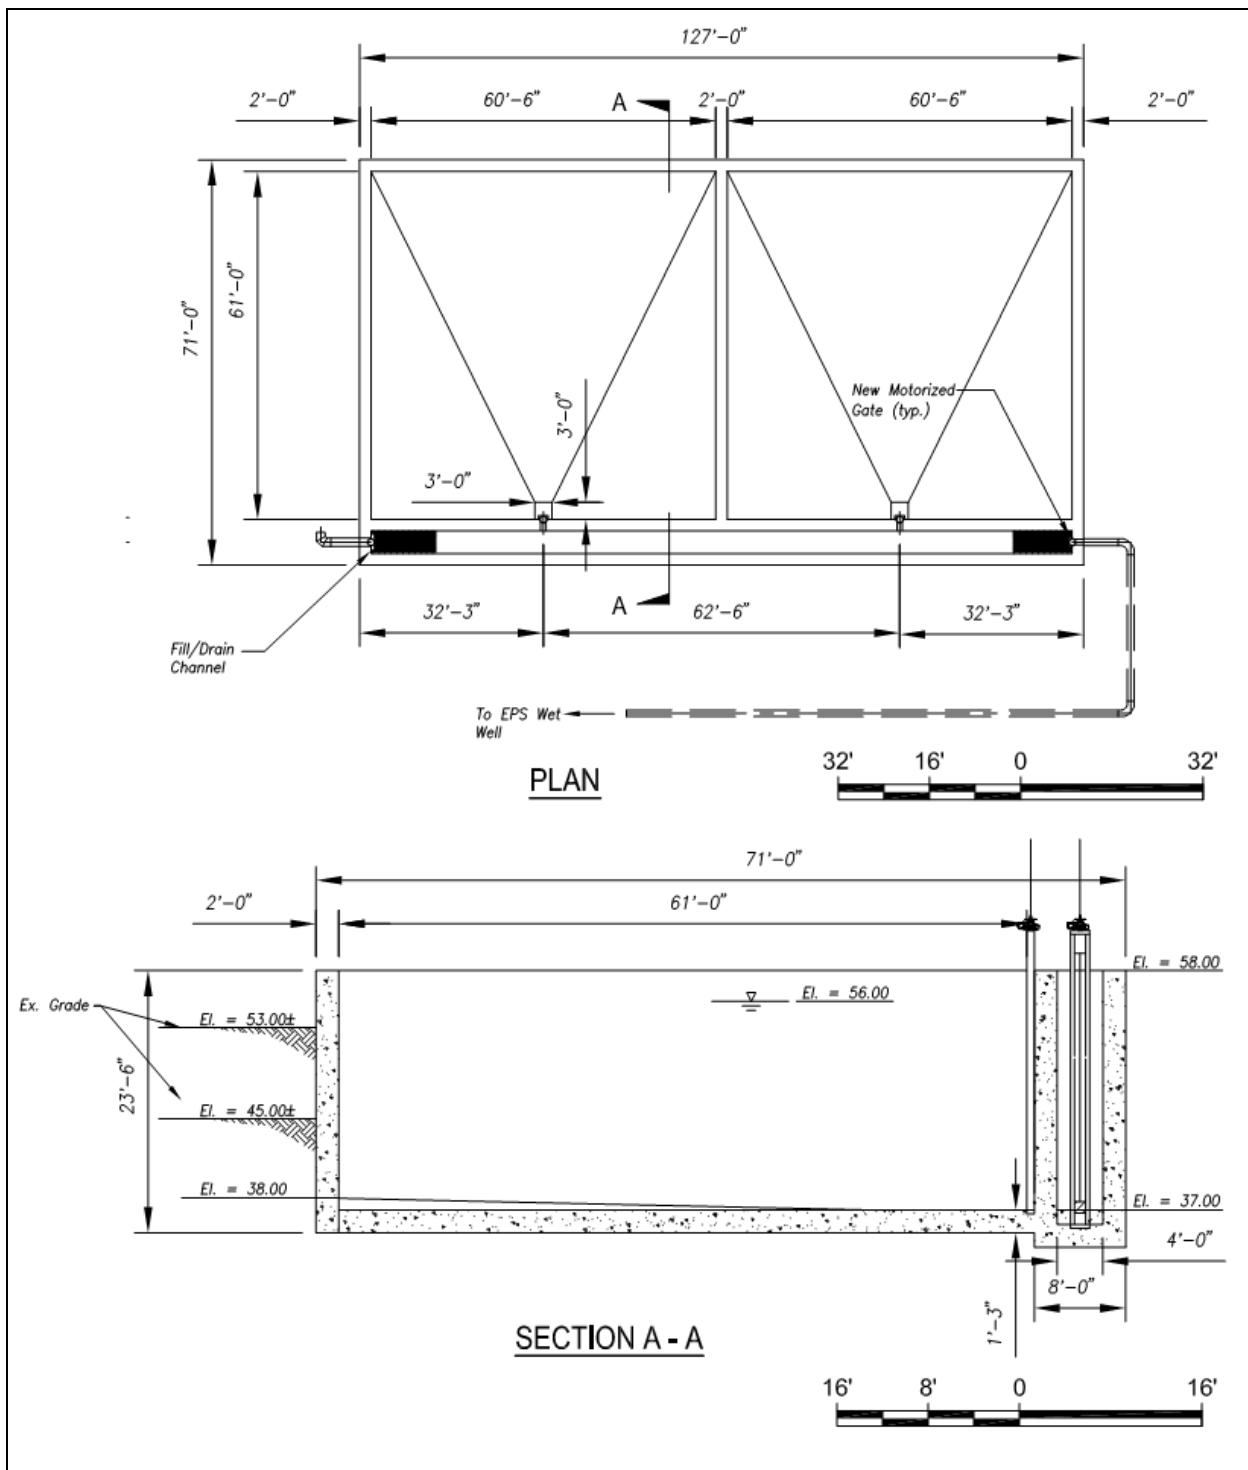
Option 2: Plan and Section Views - 1 MG EQ Basin at Ex. Storage Tank Site
